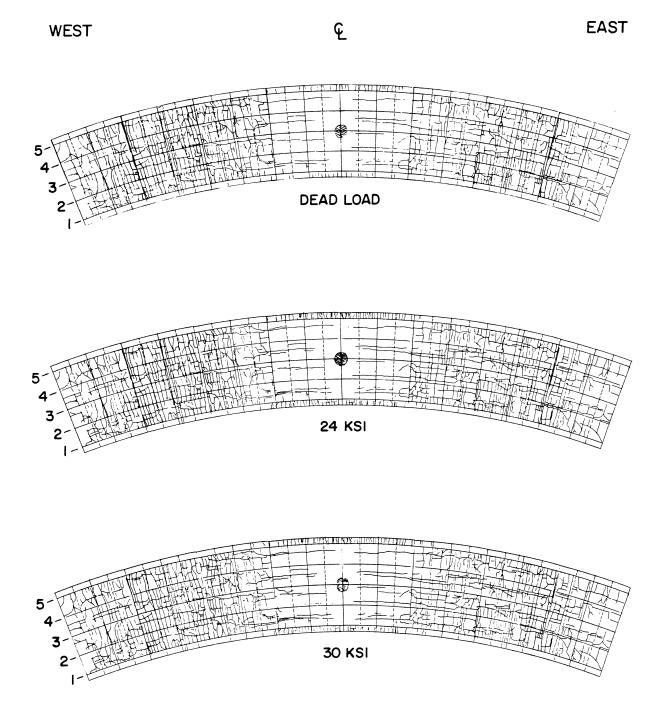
CRACK HISTORY FOR BOTTOM SLAB
